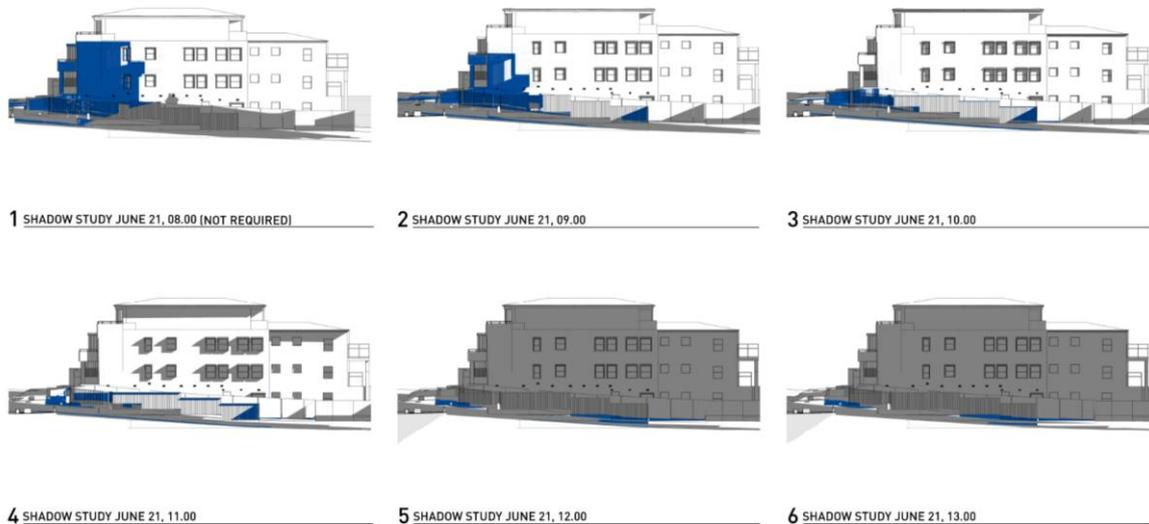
Elevational shadow diagrams (59 Burnie St) – 8am to 1pm (Source: Smart Design Studio)
